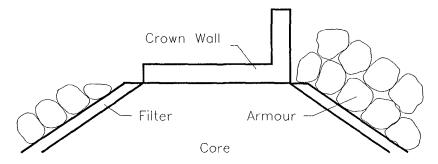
Placement of Armour Stone Adjacent to Crown Wall
